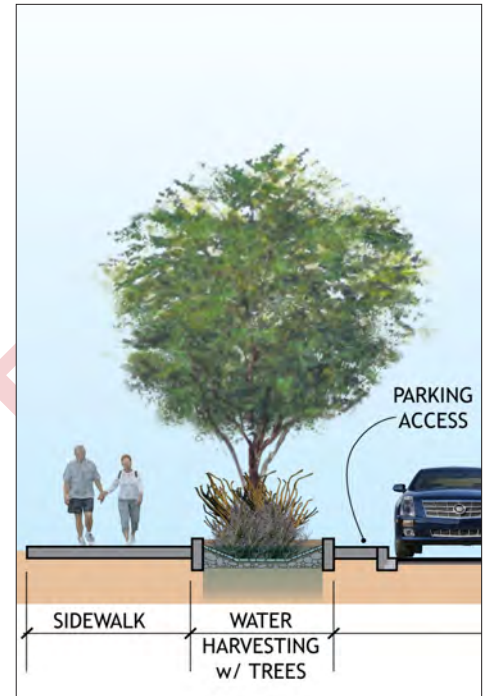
m: TYPE 3 - Sidewalk and water harvesting landscape with trees and paved parking access.
